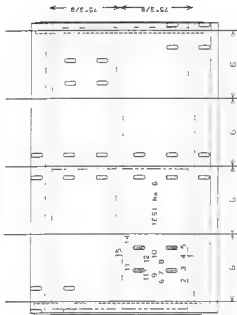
LVDT Locations (Second Bridge - Test No 6)
